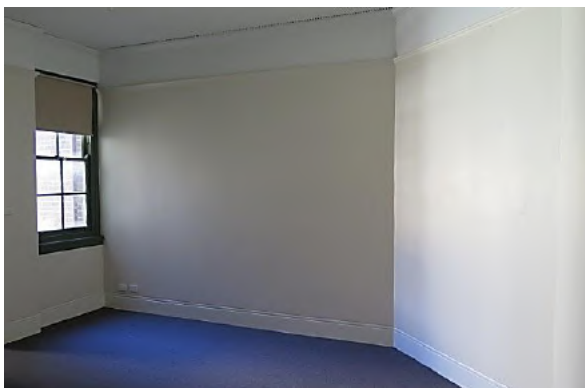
Living room (space 1.3)—48A Gloucester Street, showing original cement run skirtings, timber picture rail, and timber double-hung sash window. (Source: GML Heritage, May 2016)
